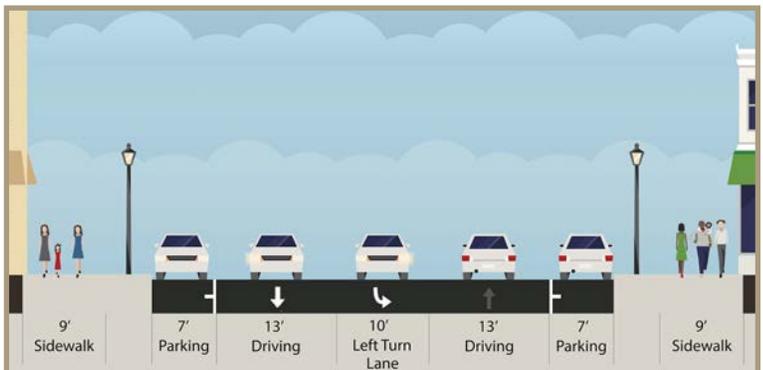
Looking south on Center Street at South Avenue, existing conditions.
